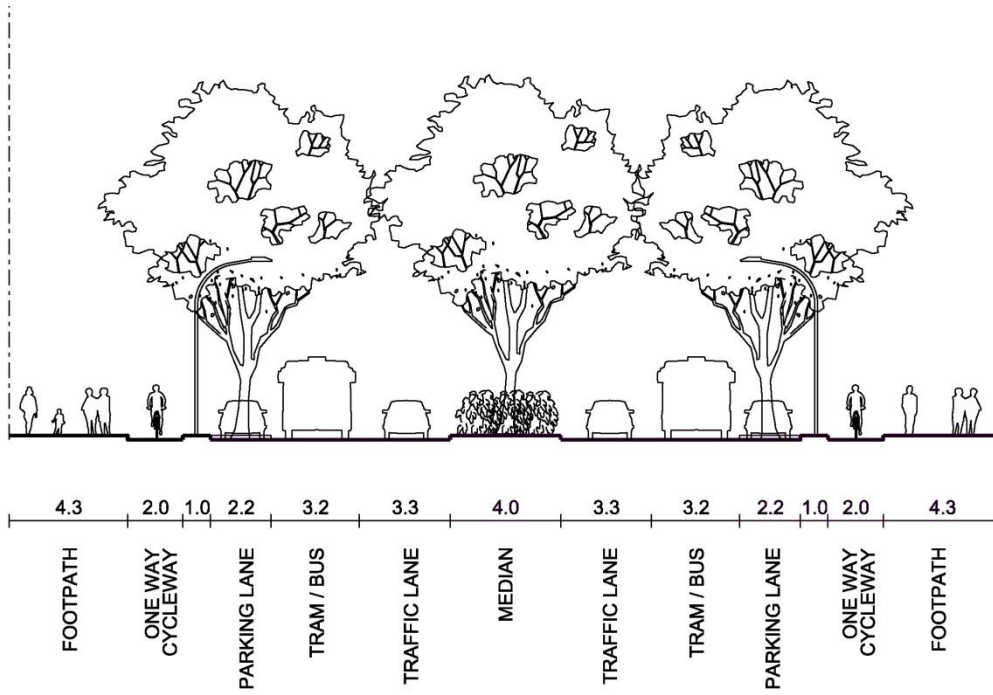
Epsom Park- Zetland Avenue (36m) Section A2
